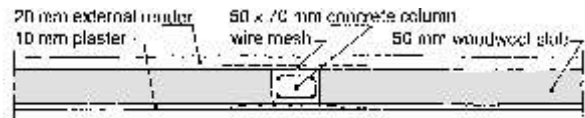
Wall element in the “Climatex system” consisting of 50 mm thick woodwool slabs with columns and beams of reinforced concrete. The elements are rendered and plastered (U-value = 1.3 W/m²K).
